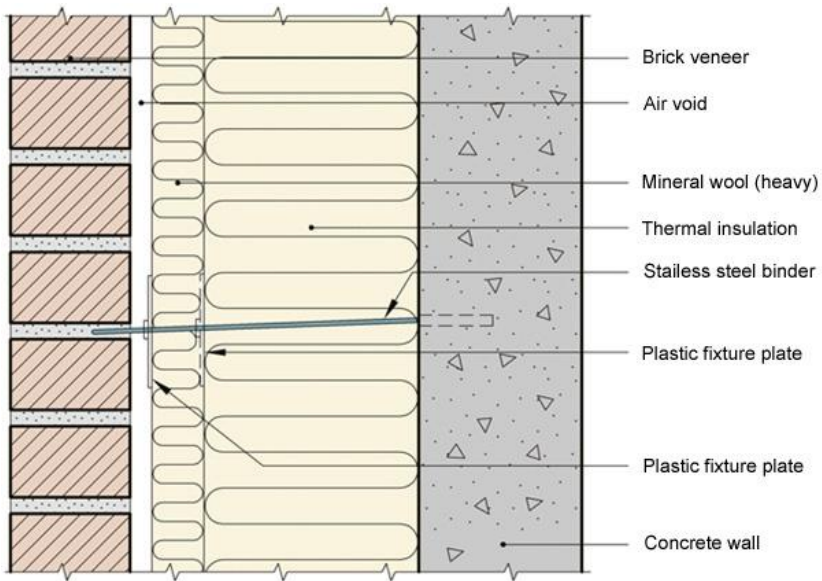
Brick veneer on concrete wall (Kvande 2009).
